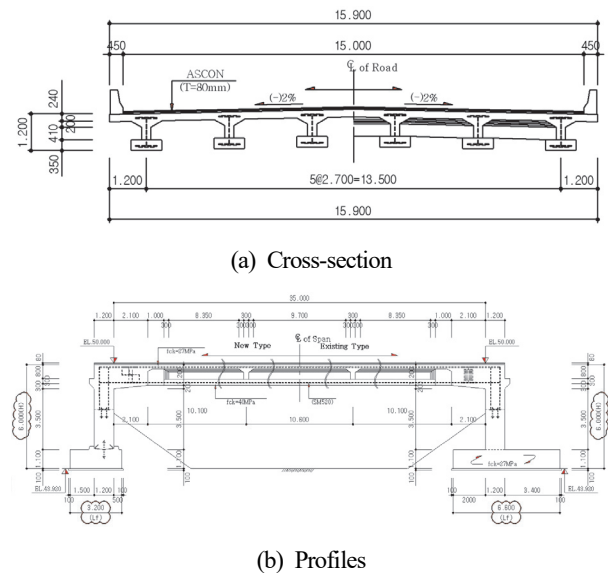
Design plan of existing and suggested type rahmen bridges^{[1],[2]}
